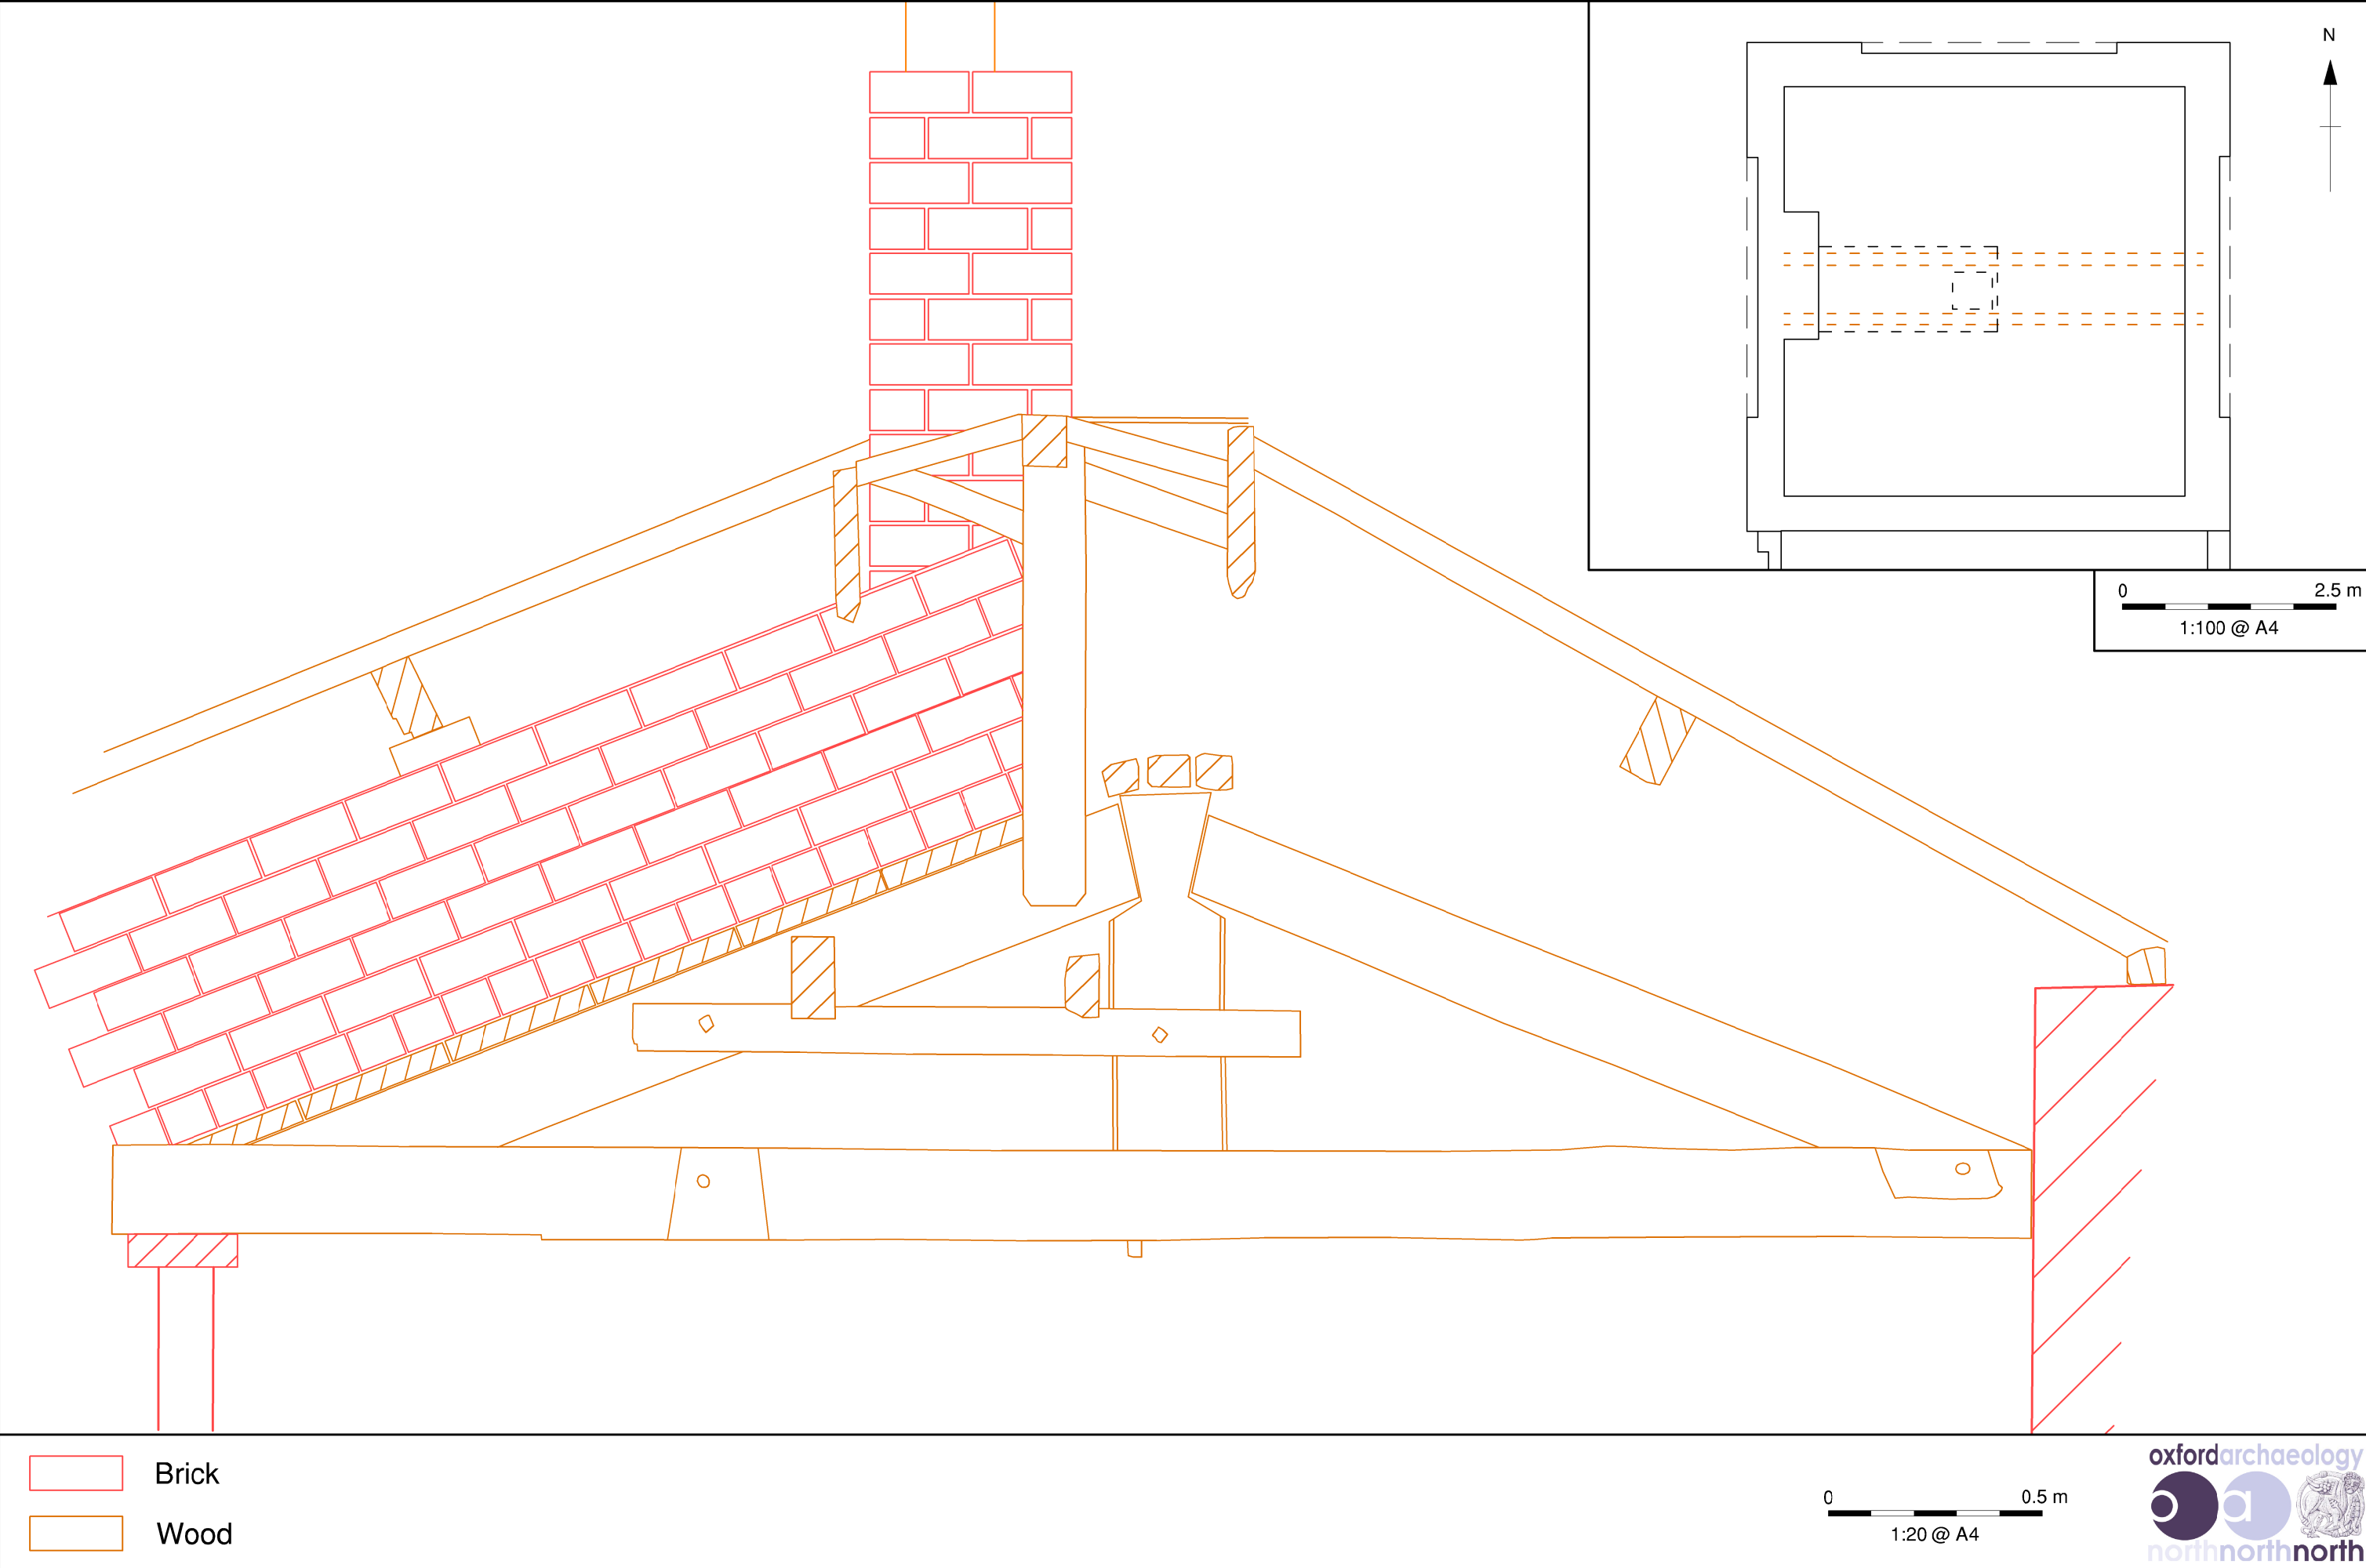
Cross-section through roof space at northern end of the former stable block, showing chimney arrangement
